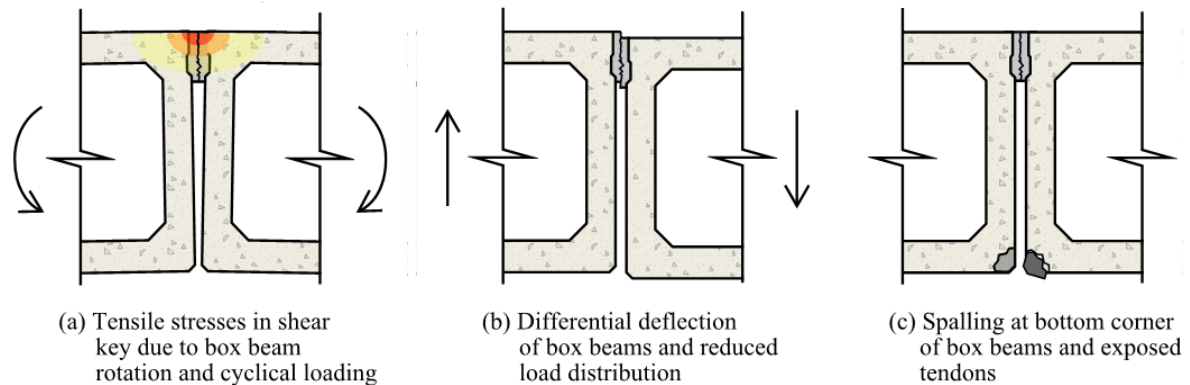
Deterioration Mechanisms of Adjacent Box Beams
